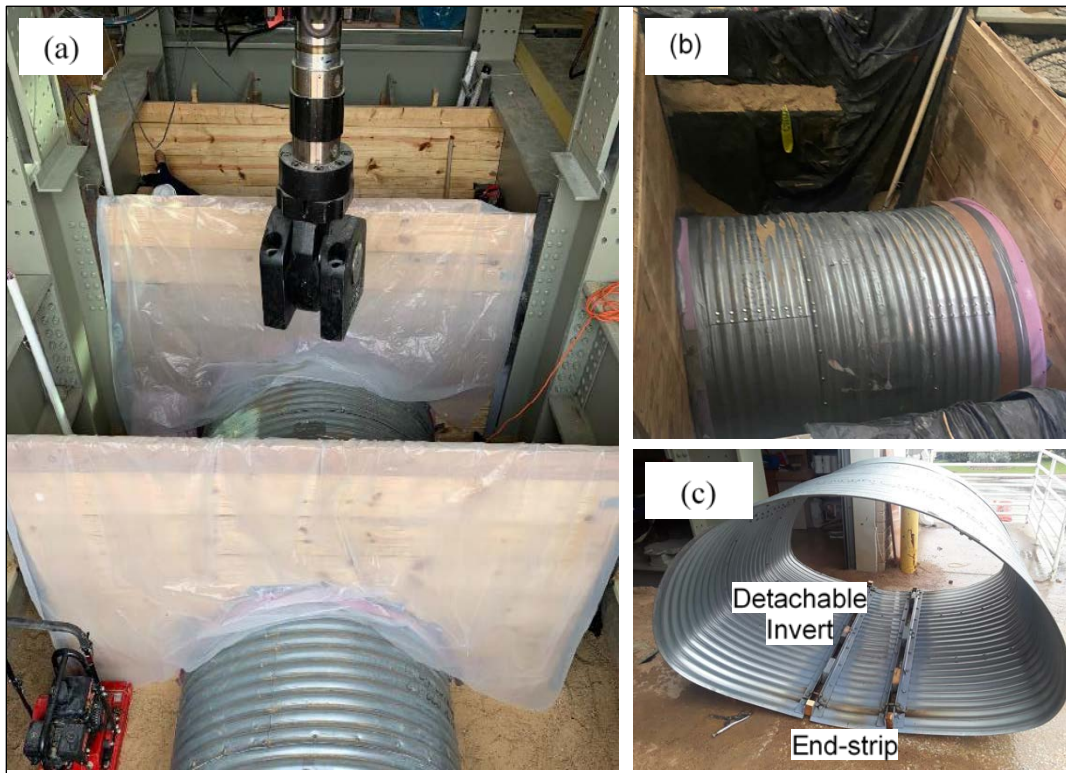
Pipe installation: (a) longitudinal configuration of arch CMPs in the soil box of 25 ft × 12 ft × 10 ft at CUIRE, (b) an arch CMP with end sealing, and (c) an arch CMP sample with detachable invert and end-strip section.
